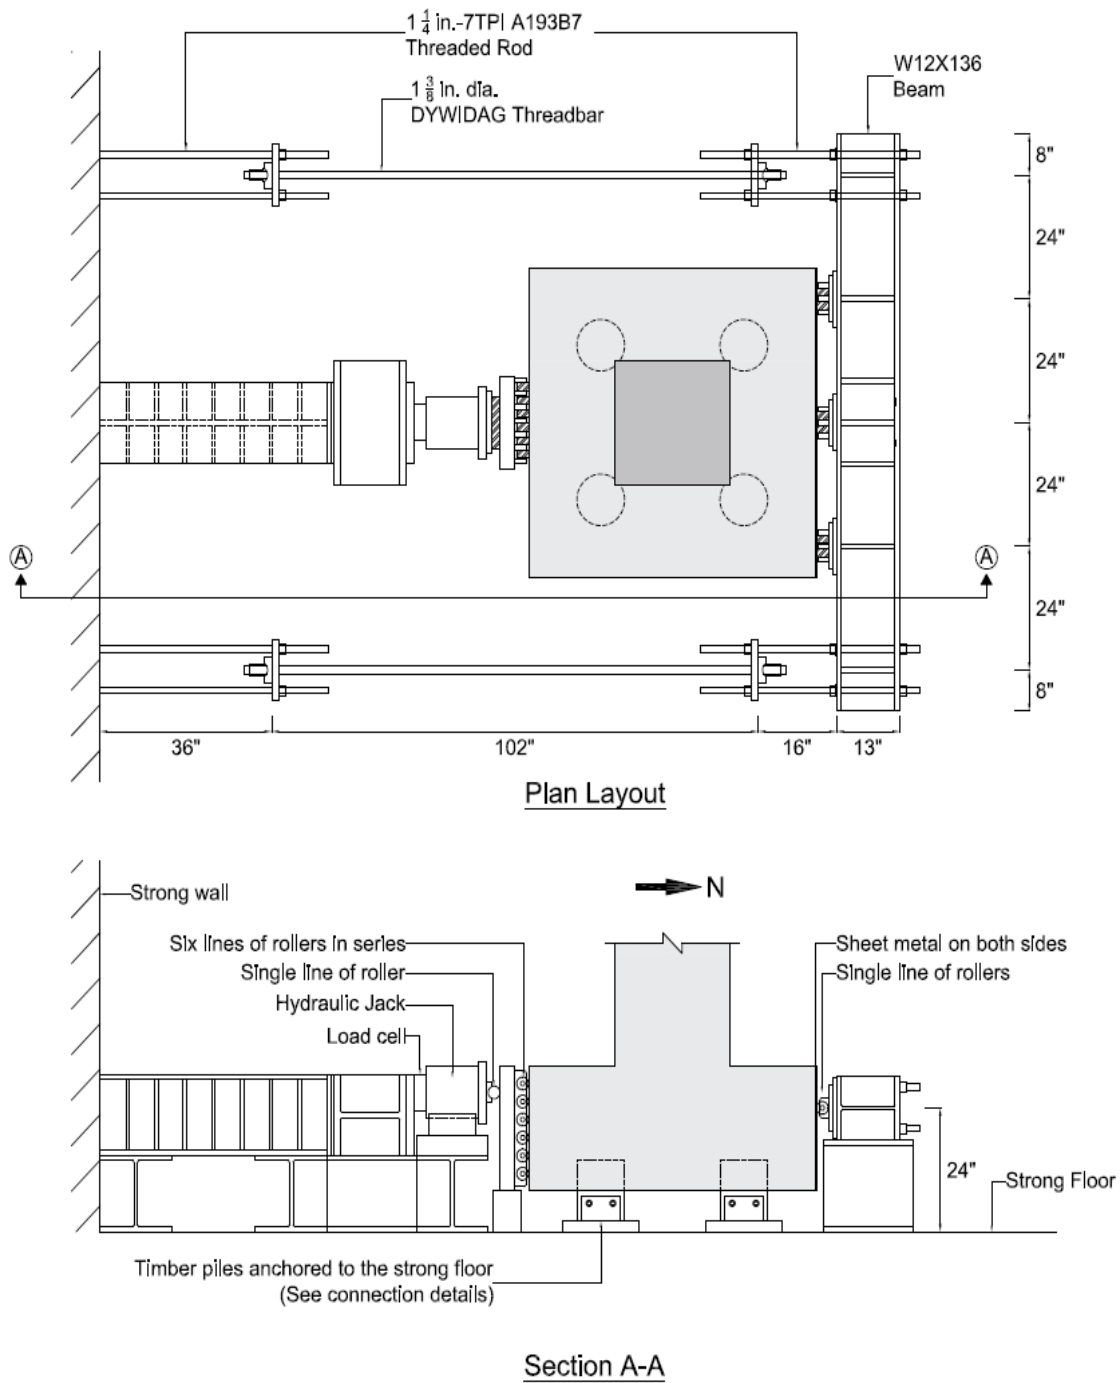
Specimen R-S-R-LTi-90-Pile: Lateral loading setup (East elevation, lateral restraints for footing not shown completely)
